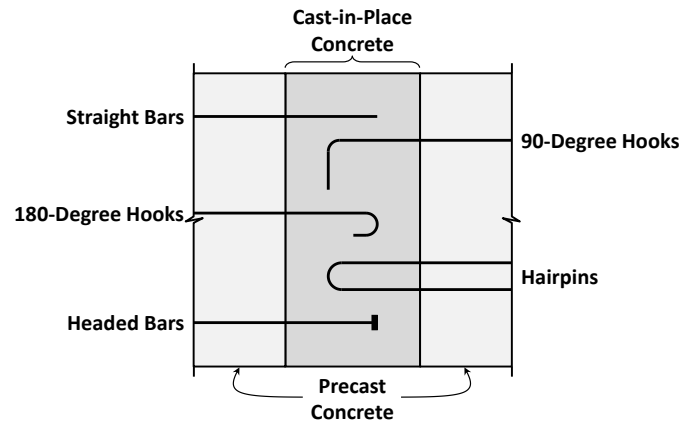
Possible bar details for longitudinal interface reinforcement
